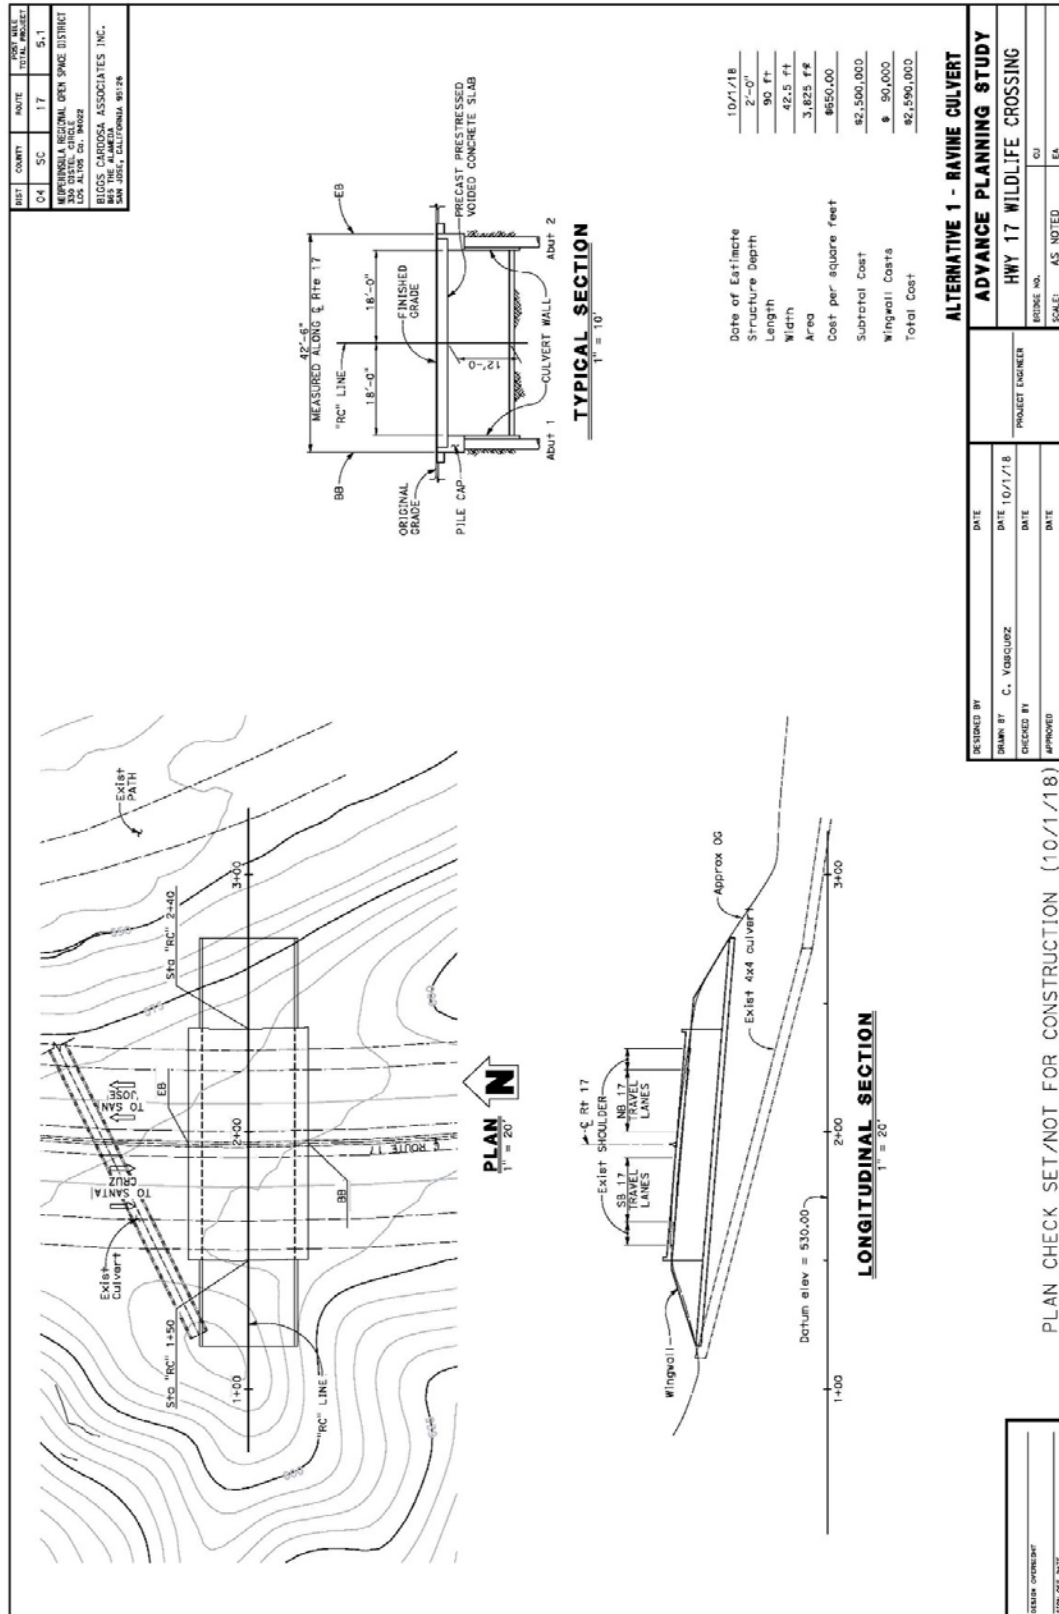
Conceptual Engineered Plan – Alt. 1, Ravine Wildlife Undercrossing
